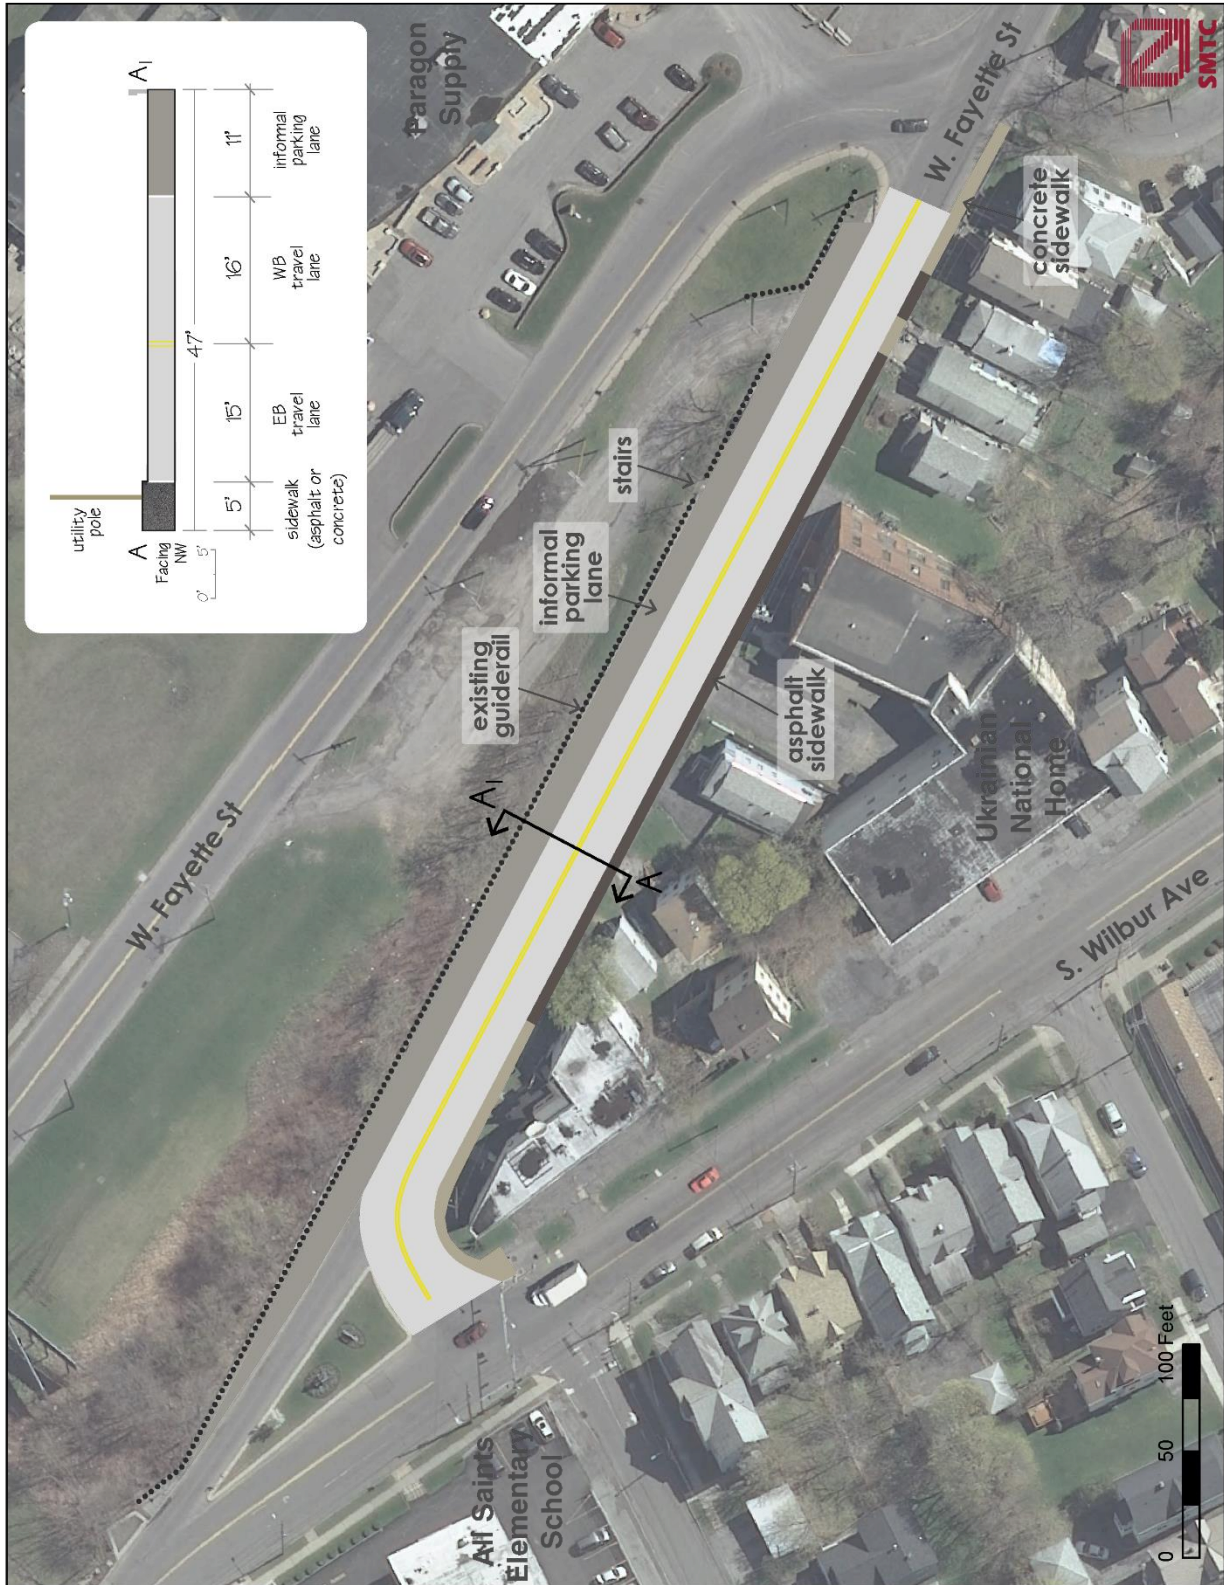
West Fayette Street Section Elevations (Between South Wilbur Avenue and Nelson Street/West Fayette Street)
